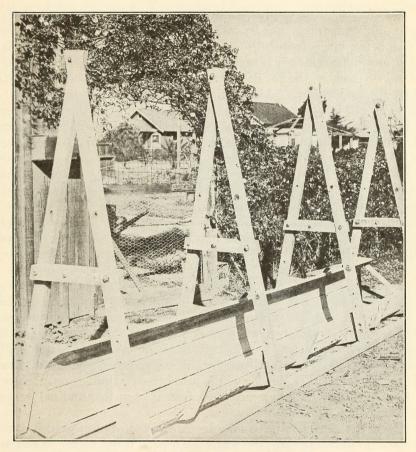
Form used in incasing riveted steel pipe with concrete.
